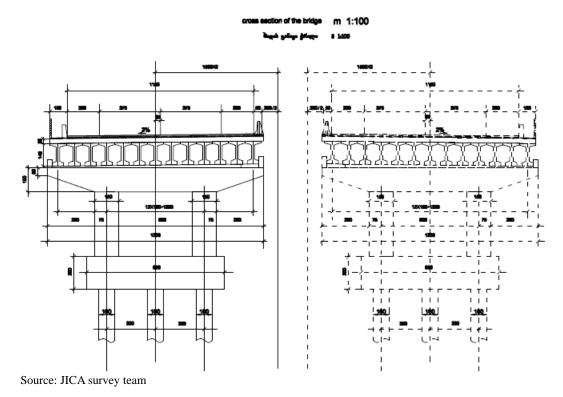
Standard Cross Section (Bridge Section – Temporary)
